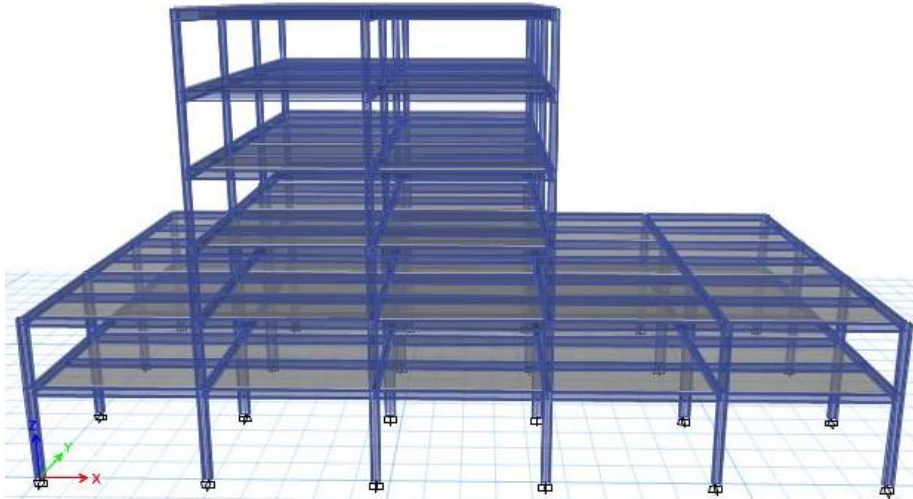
3D view of (2Rx1L) 6 story elevation
